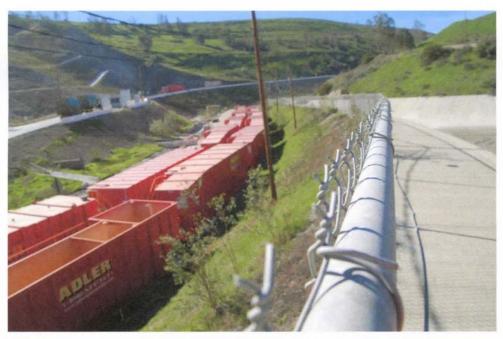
Storage tanks to store stormwater from new temporary unlined earthen basin
